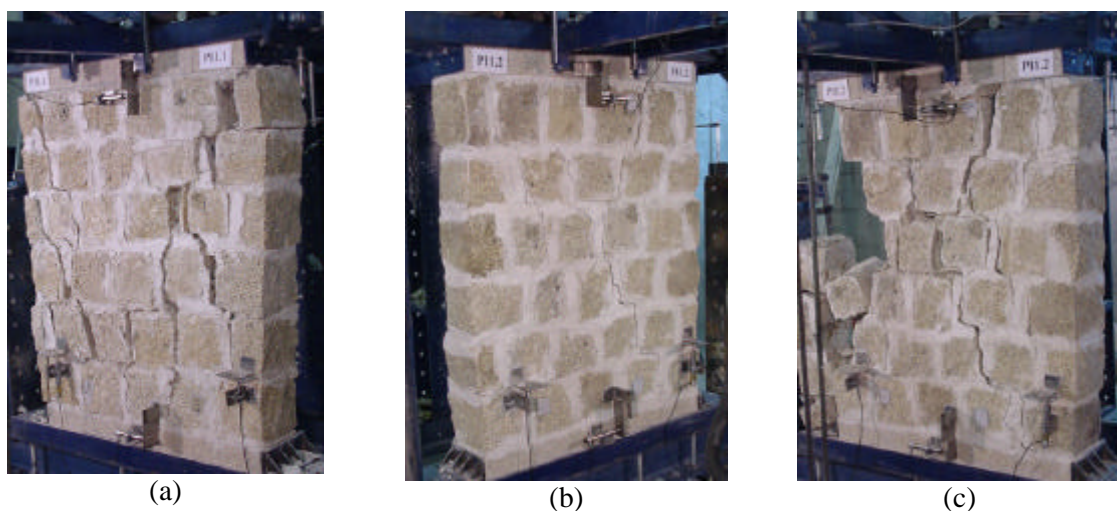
Failure mode and collapse of the walls WI.250; (a) collapse of the wall WI2.250; (b) crack patterns of wall WI2.250; (c) failure pattern of the wall WI3.250
